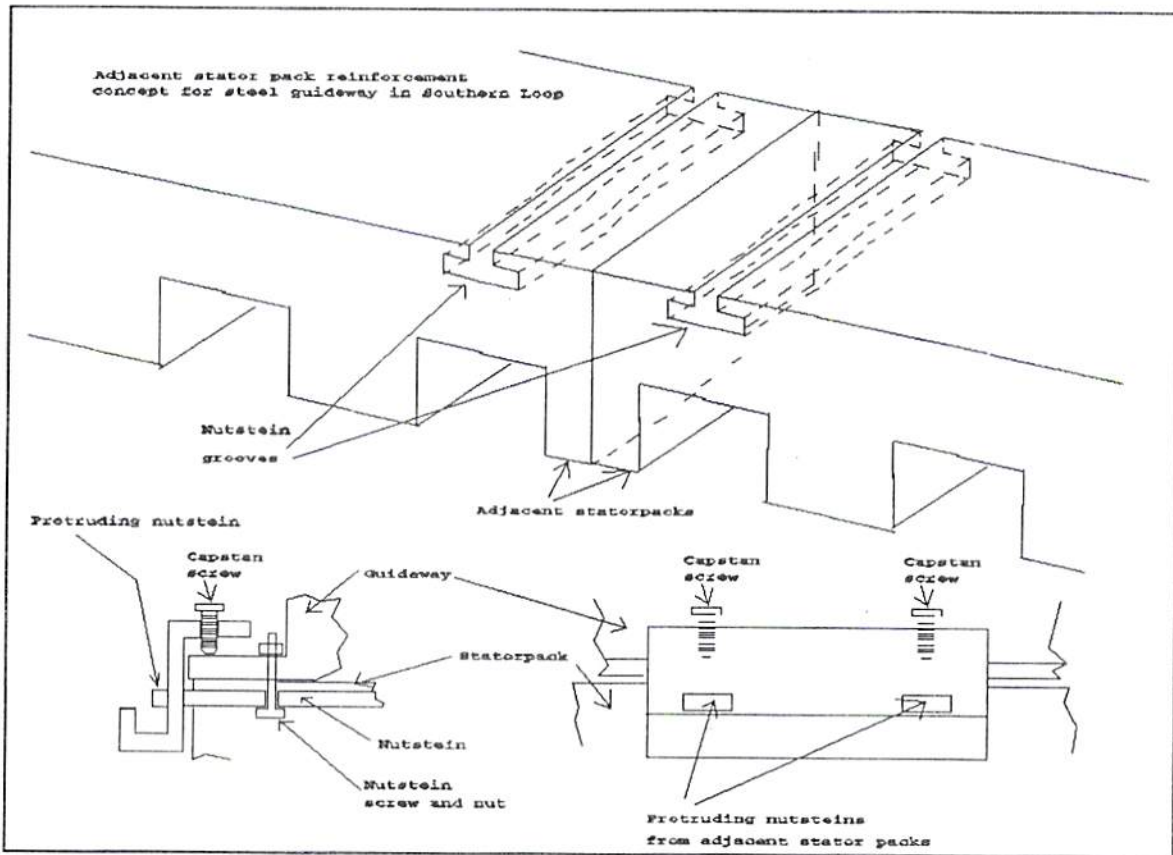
Stator Pack Dropaway Prevention Concept for Steel Guideway on Southern Loop
